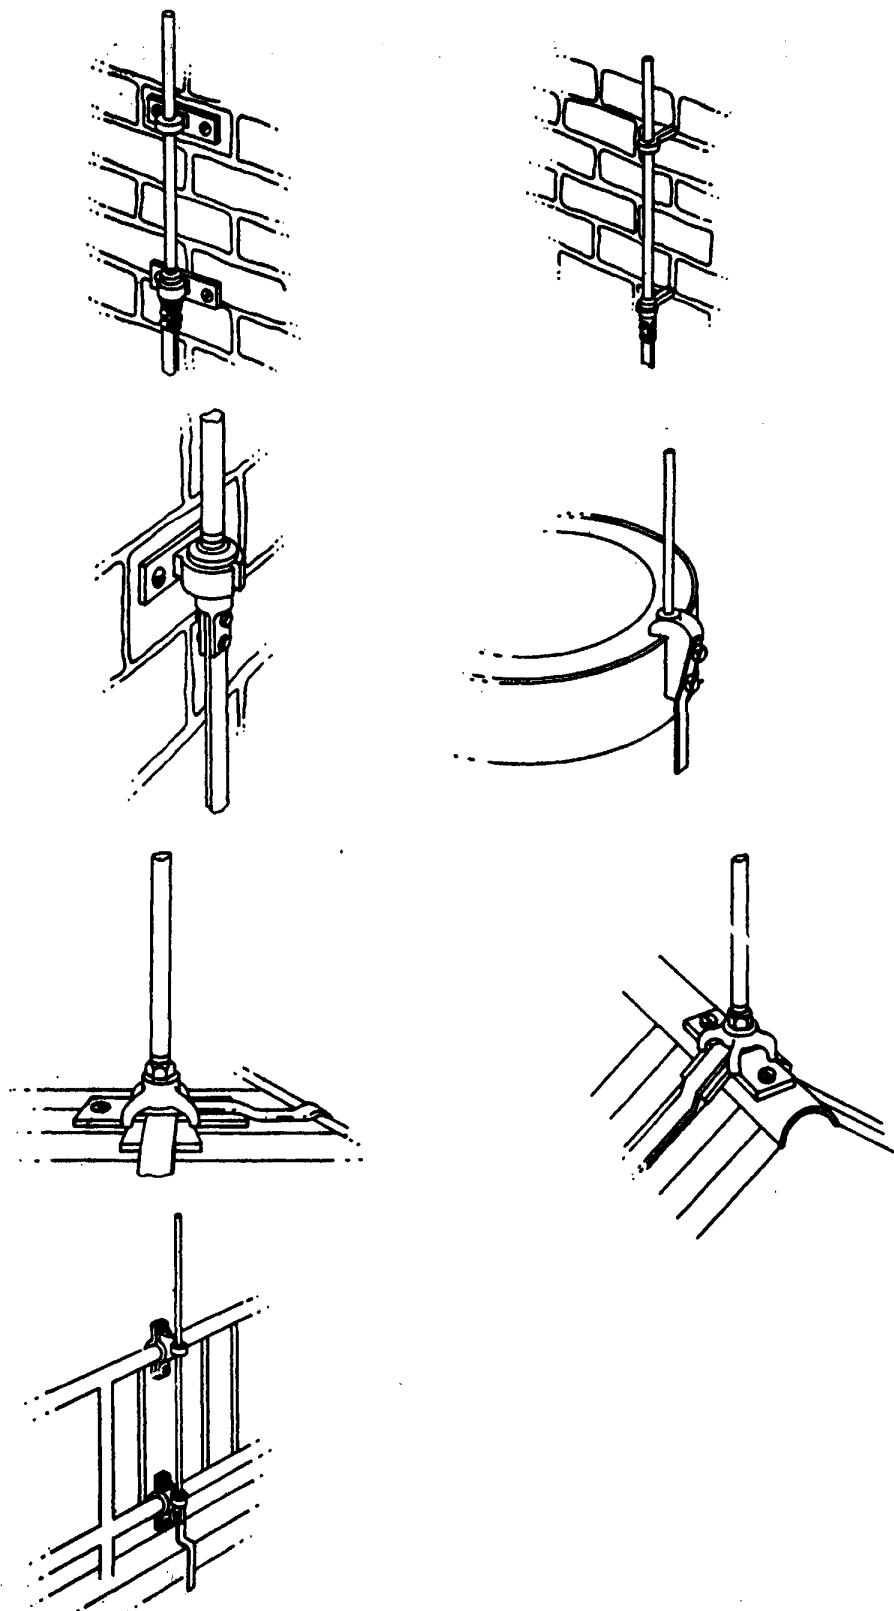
TYPICAL FORMS OF VERTICAL AIR TERMINATIONS
